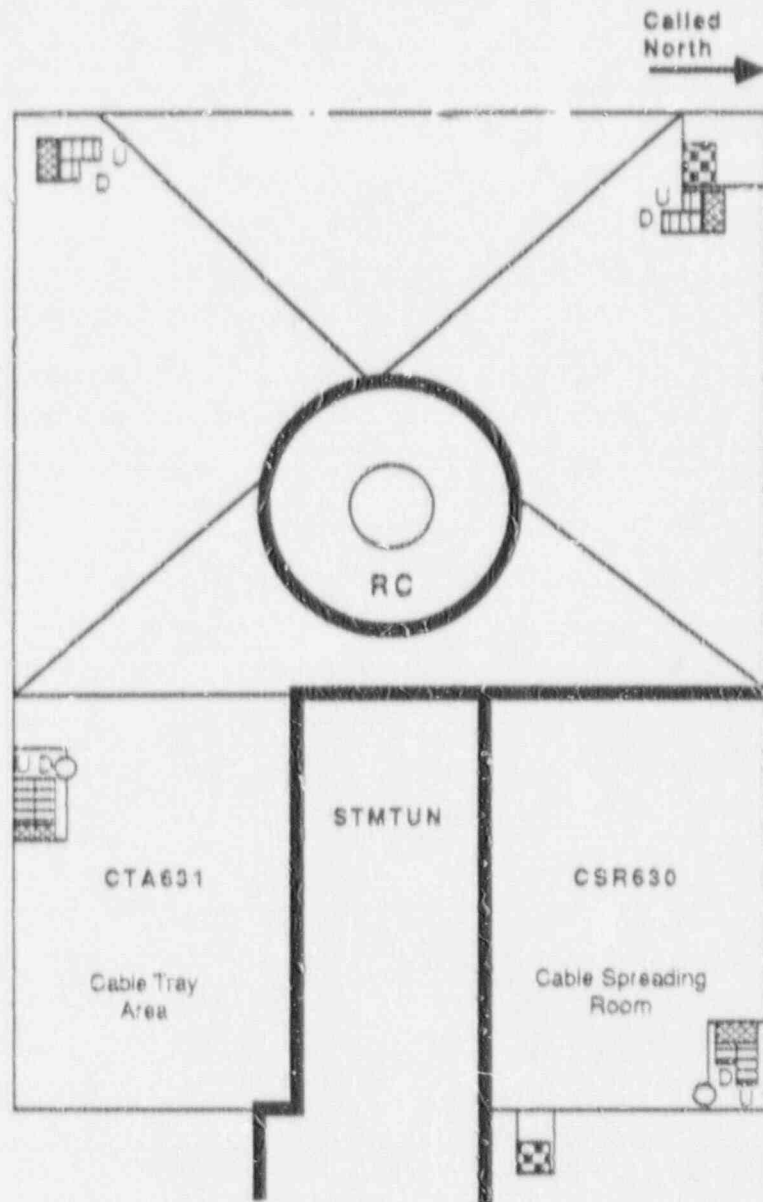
Enrico Fermi Unit 2 - Reactor Building and Auxiliary Building Mezzanine Between 2nd and 3rd Floor -631 ft. Elevation
